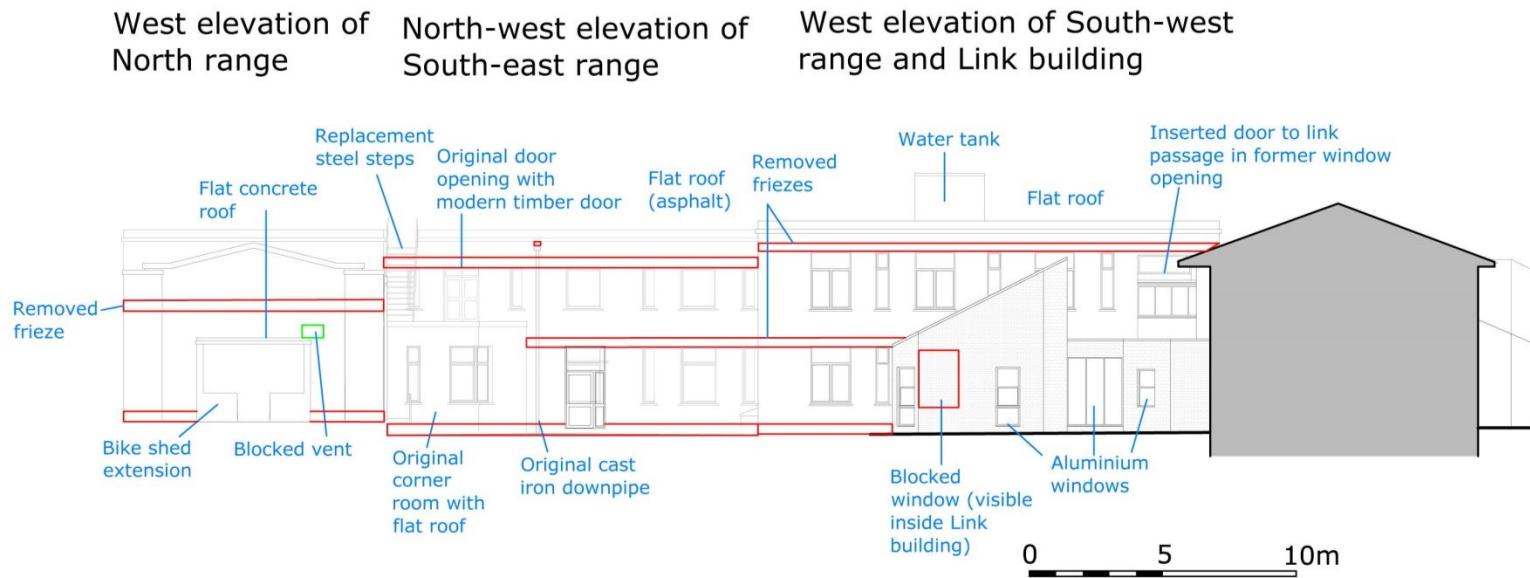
West and north-west elevations of Quadrangle and Link Building.
